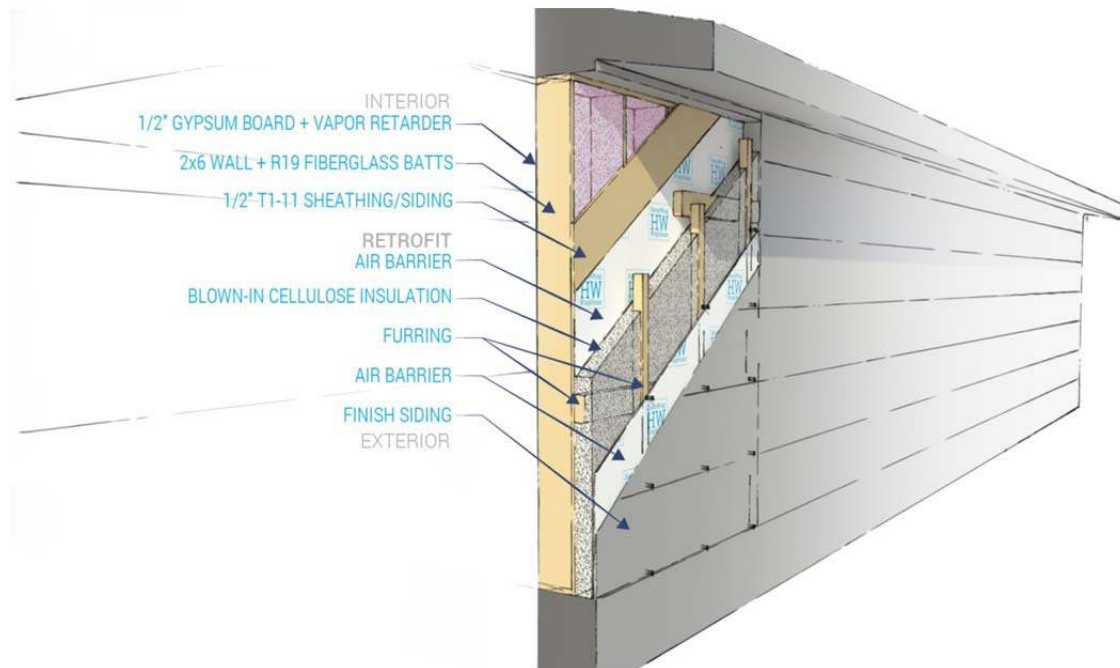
Cellulose curtain wall. This wall has an exterior curtain frame to contain 3 inches of cellulose.
